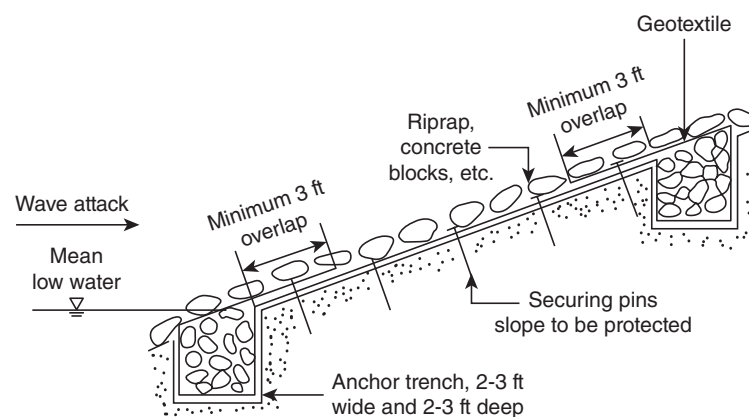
Slope protection using geotextile. (TM 5-818-8)
